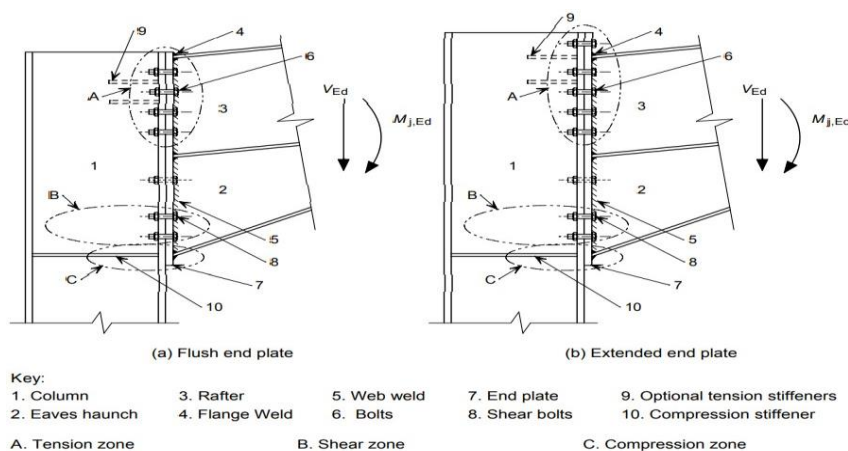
Portal frame eaves connections with bolted end plate (Brown et al., 2013)
